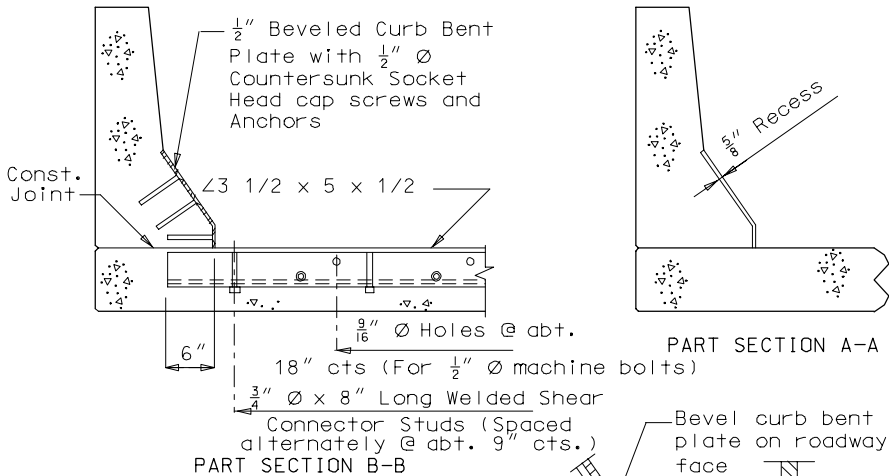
DETAILS AT END BENTS (PRESTRESSED STRUCTURES) Silicone Expansion Joint Sealant
